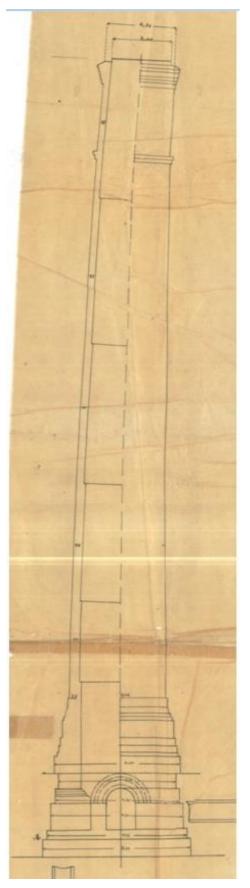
Archive document of Halkapınar Water Pump Station (Original Steam Chimney Section in 1898)
